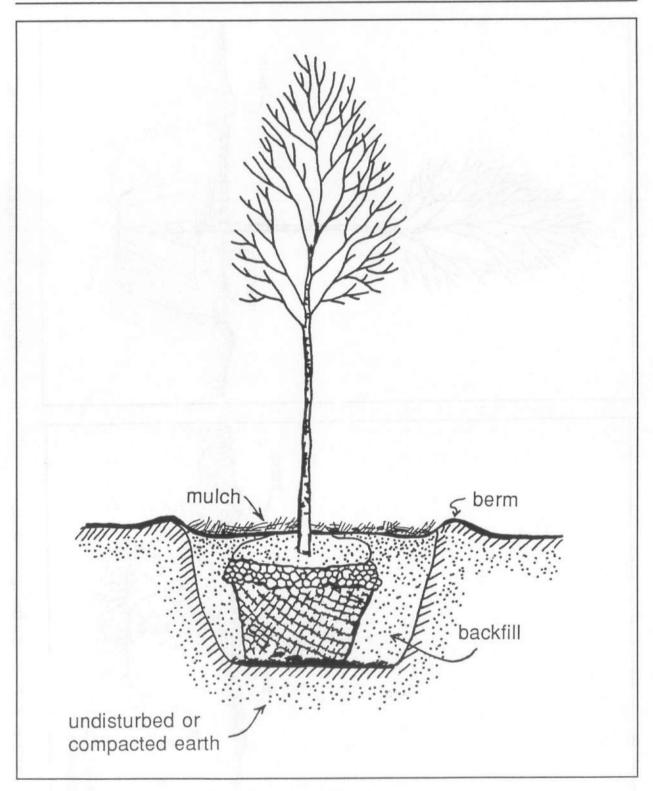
Planting a Balled and Burlapped Tree.
